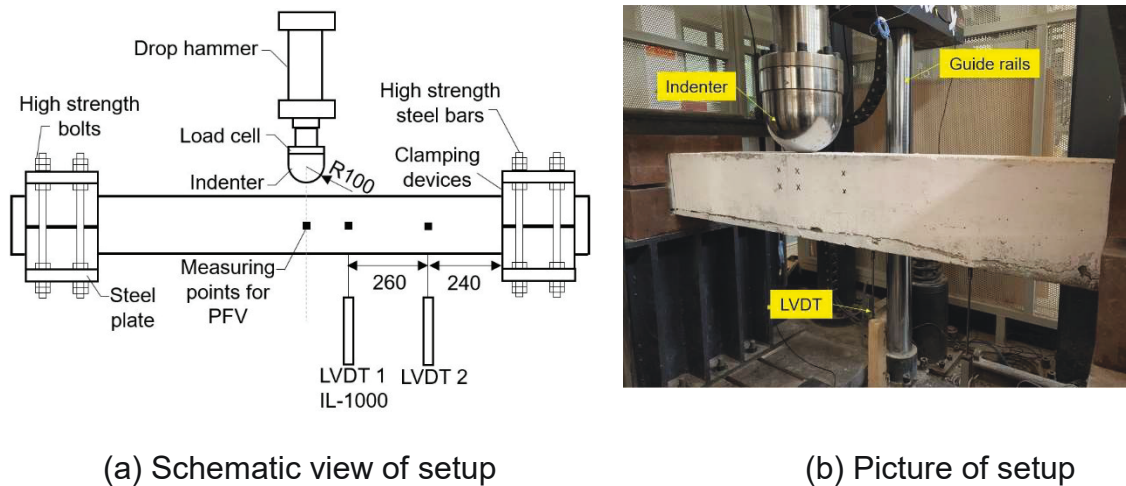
Drop hammer impact test setup (unit: mm)
